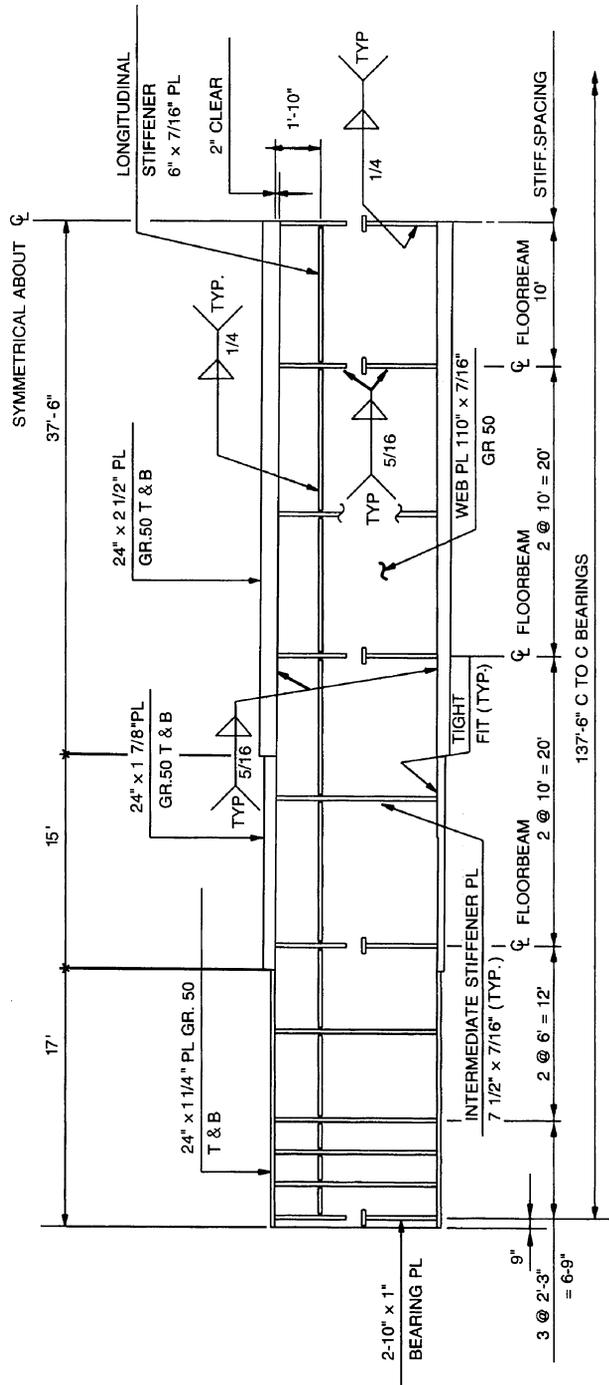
Details of deck plate girder for four-lane highway bridge.
